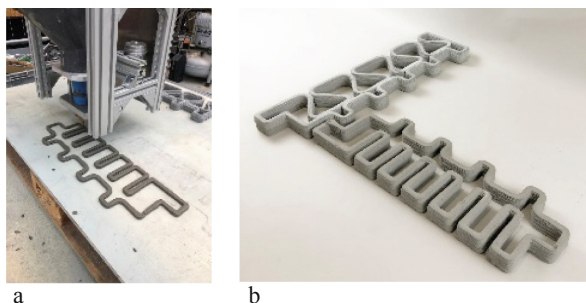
Printed prototypes. a) Large paste extruder. b) Section of wall element.
